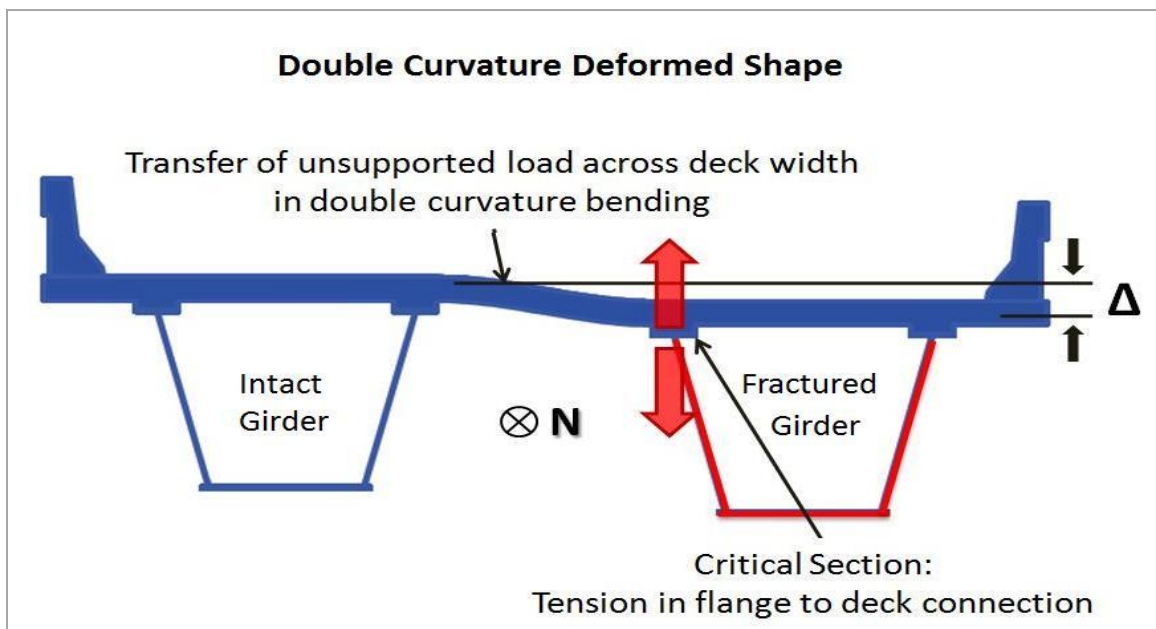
Deformed shape of the bridge in double curvature during Test 2
